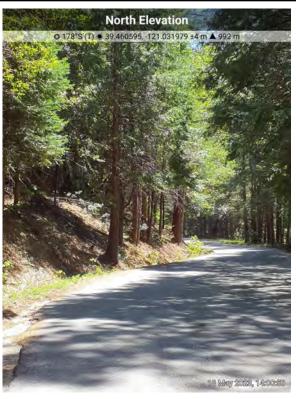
Roadside ephemeral drainage on the Mountain House Road segment.
